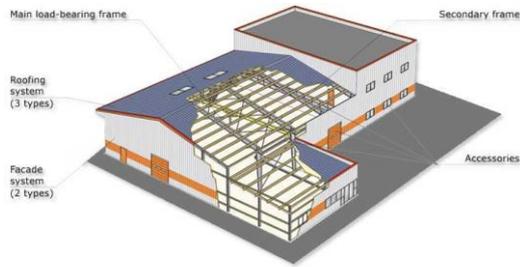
Main parts of a building as indicated by TURK Structure (2013).
